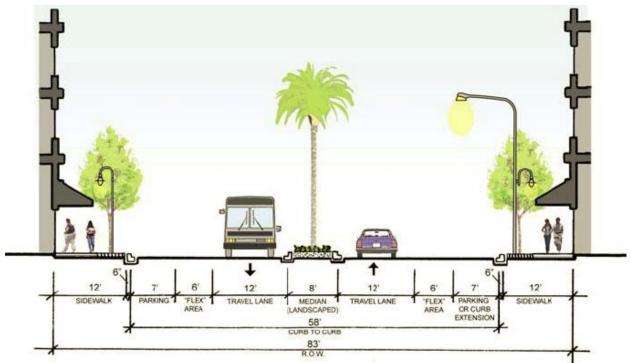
Cross-section view of the recommendation for Mission Street between Silver Avenue and Rolph Street (SFCTA 2007)
